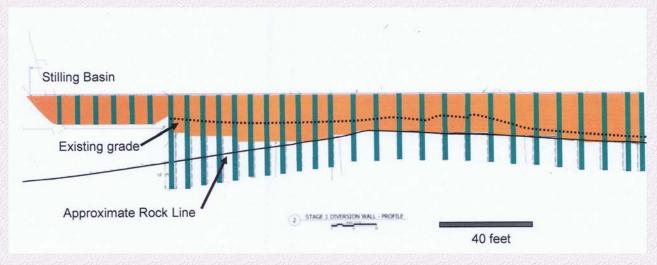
Profile of Stage 1 diversion wall showing soldier piles and steel lagging.
